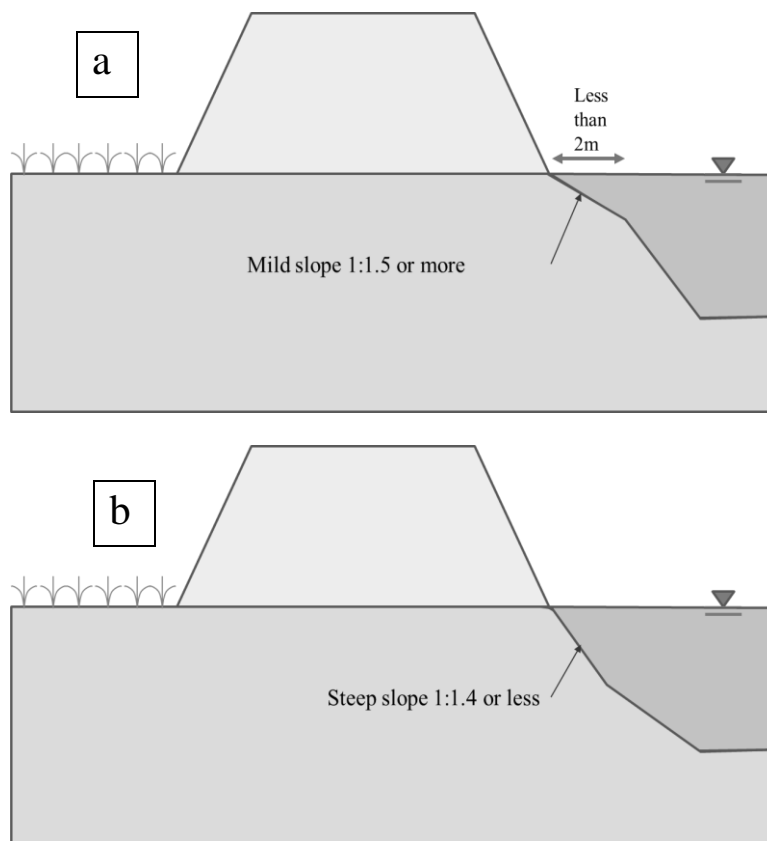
Challenging Condition; (a) situation with less than 2 m wide mild slope under toe of embankment (b) situation with steep slope under toe of embankment
